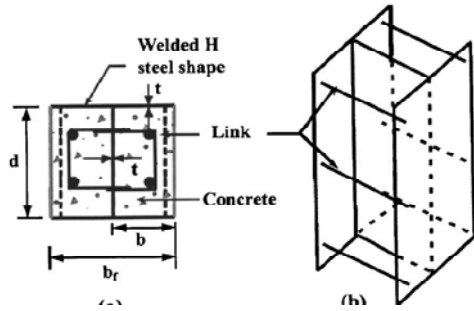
Partially Encased Composite Column with Thin-Walled Built-Up Steel Section, (a) Column Cross-Section and (b) 3D view of the Steel Configuration
